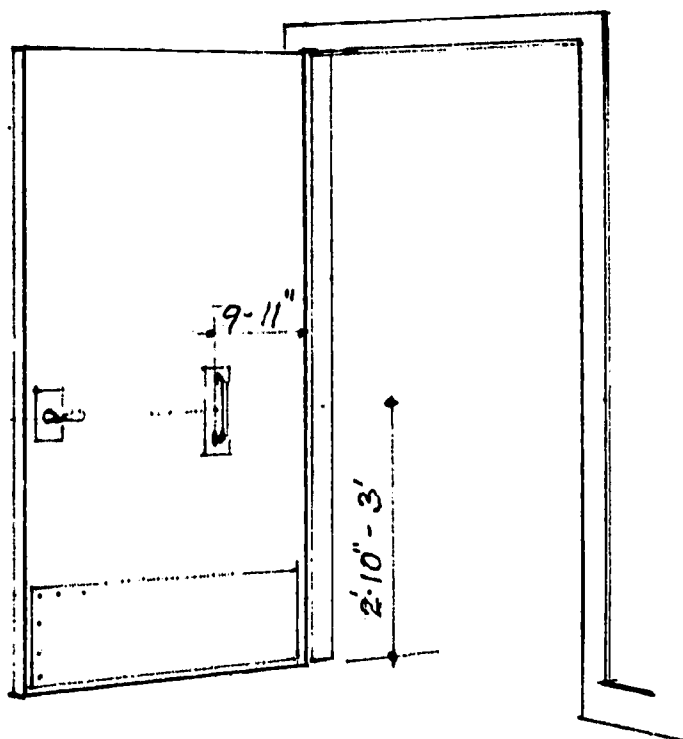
Dwelling Entrance Opening Out. Door pull assists a wheelchair user to pull door shut on entering. The door pull should be on the outside for an inward opening door.
